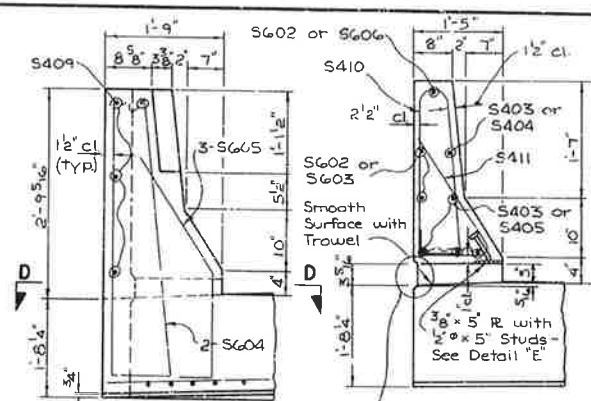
### DETAILS OF STANDARD 35'-0" R.C. SLAB SPAN
